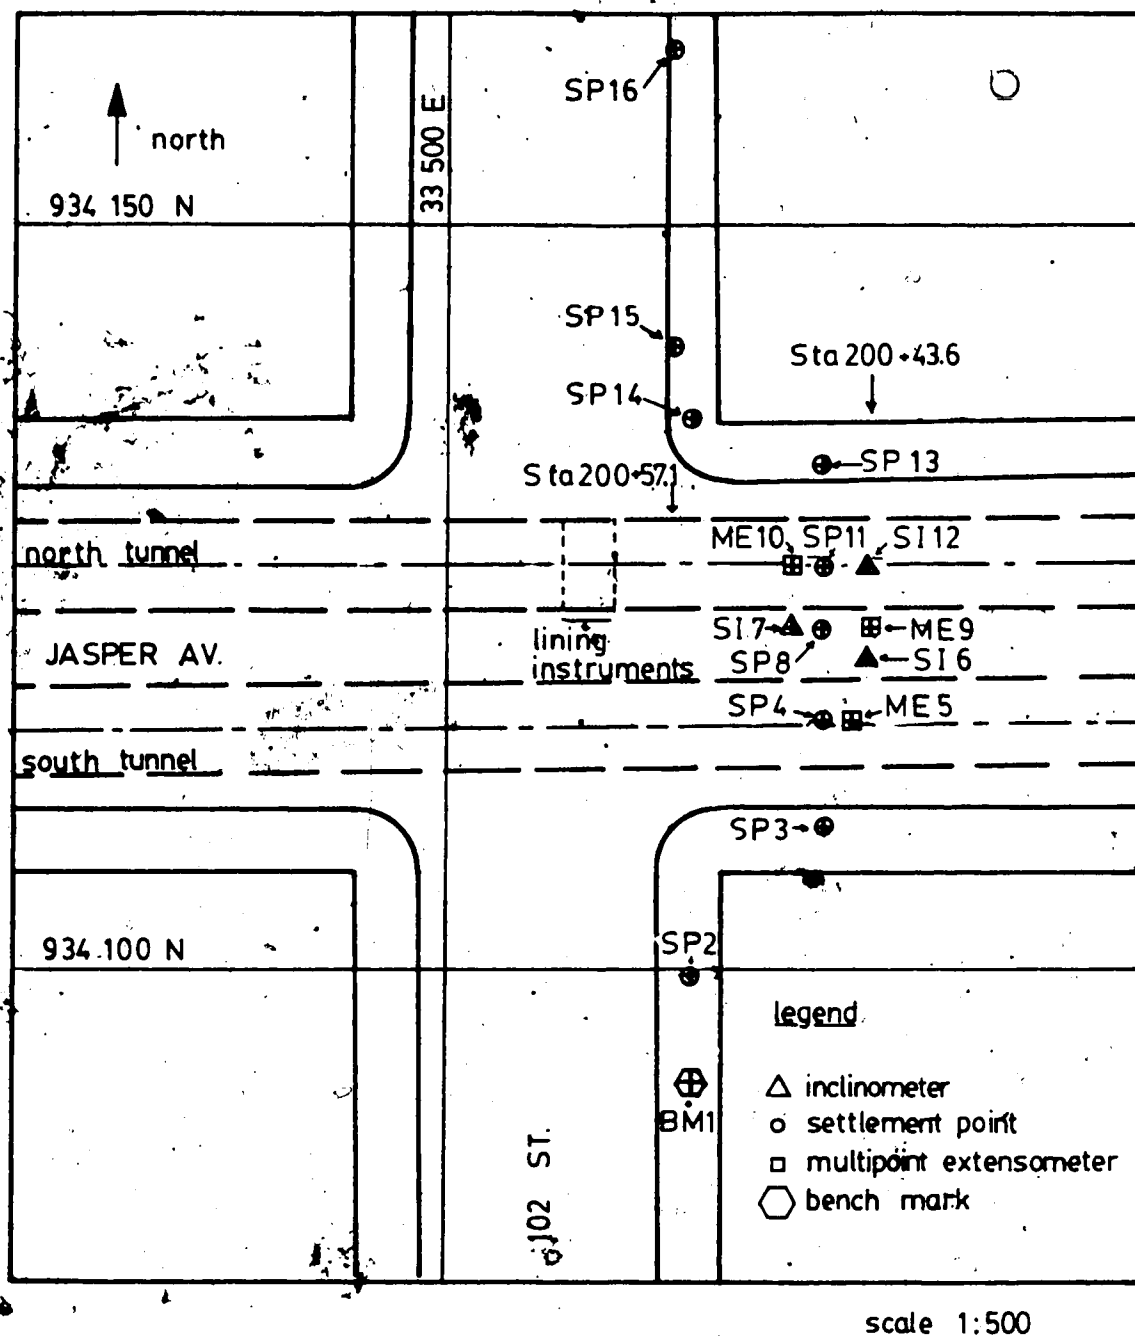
INSTRUMENTS LOCATION - PLAN VIEW
